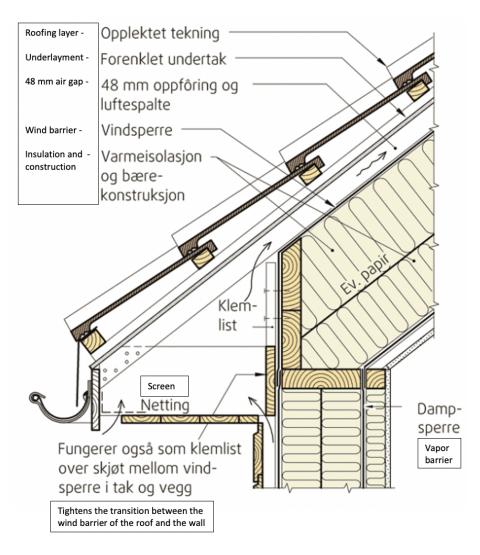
Example of roof with insulated surfaces and ventilated roofing [29].
